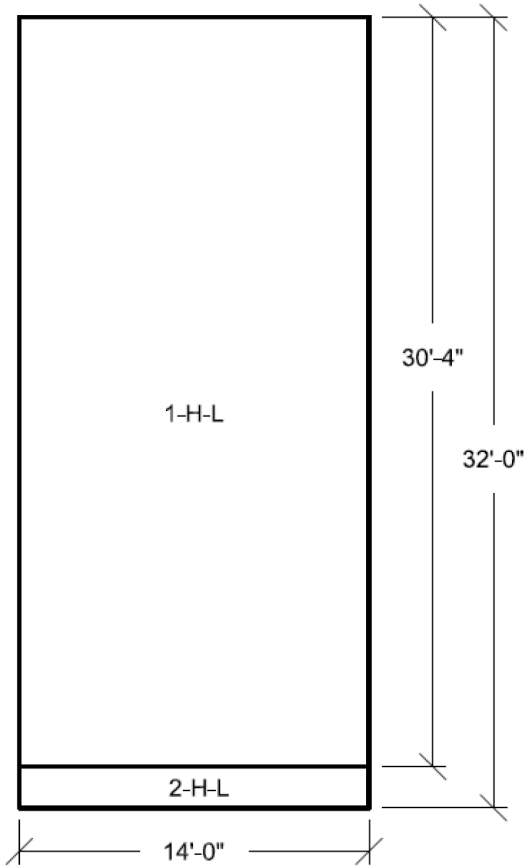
H.6-157 DGFO SV Roof 5 Looking Down
